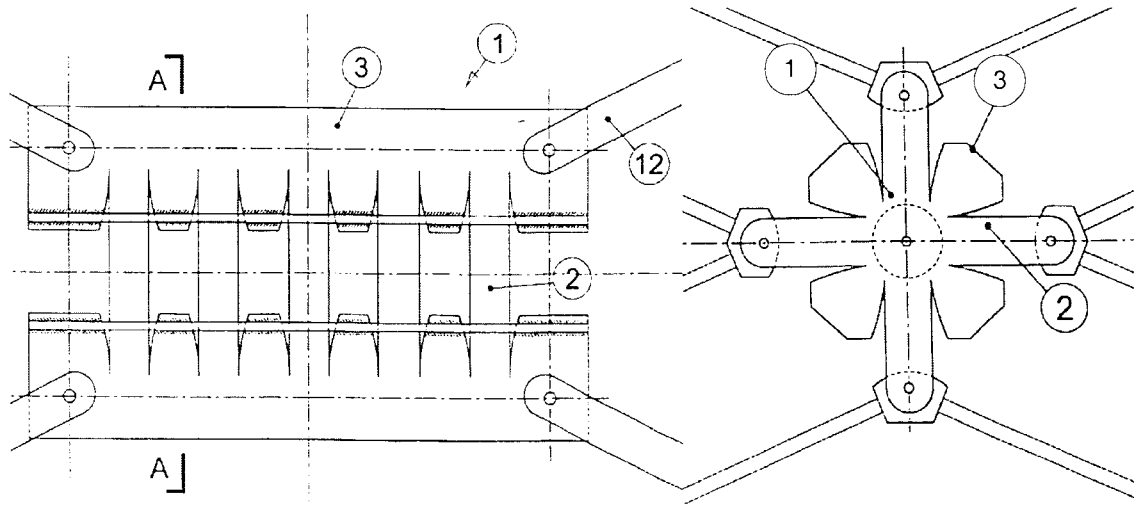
Two Campenon Bernard hysteretic dampers for steel building
